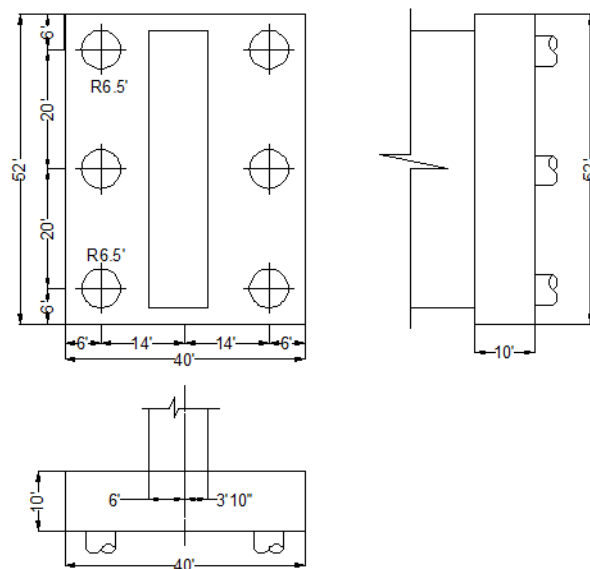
Pile group foundation (2×3) for CHSR abutments
